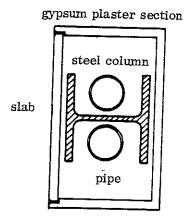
b. Freestanding column with fire insulation in the form of prefabricated gypsum plaster sections
